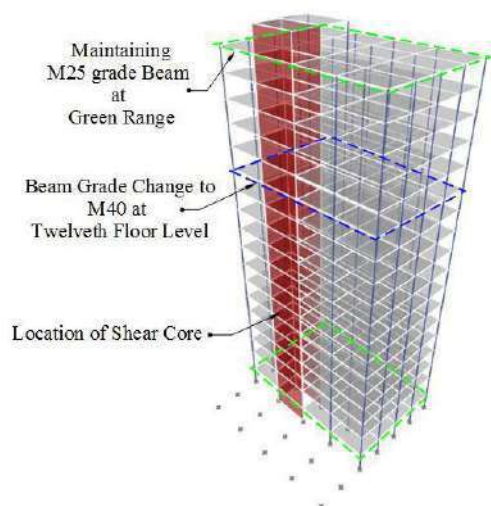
Beam Stability Case - Beams of different sizes (All M40 grade beams at twelfth floor level): Case BS5
